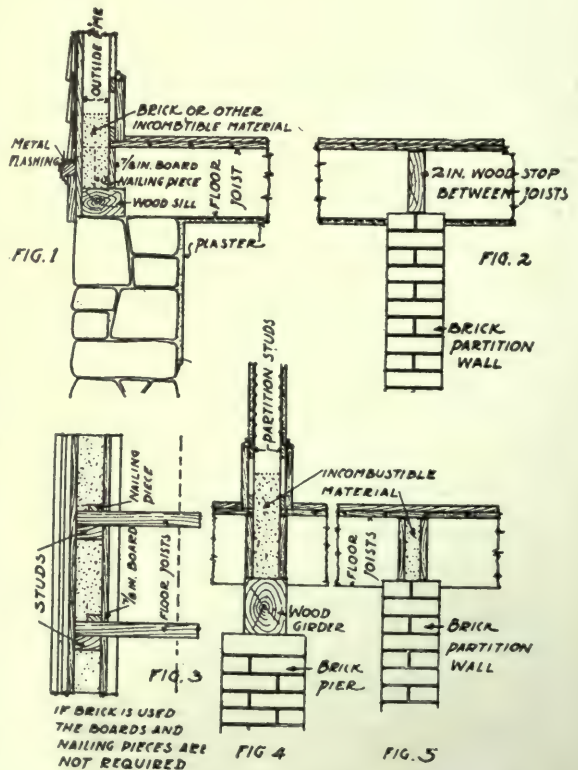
shows fire-stopping at outside wall and floor. Fig. 3 shows same in plan. Fig. 2 shows wood stop over partition. Fig. 5 same in incombustible material. Fig. shows stopping over wood girder.
